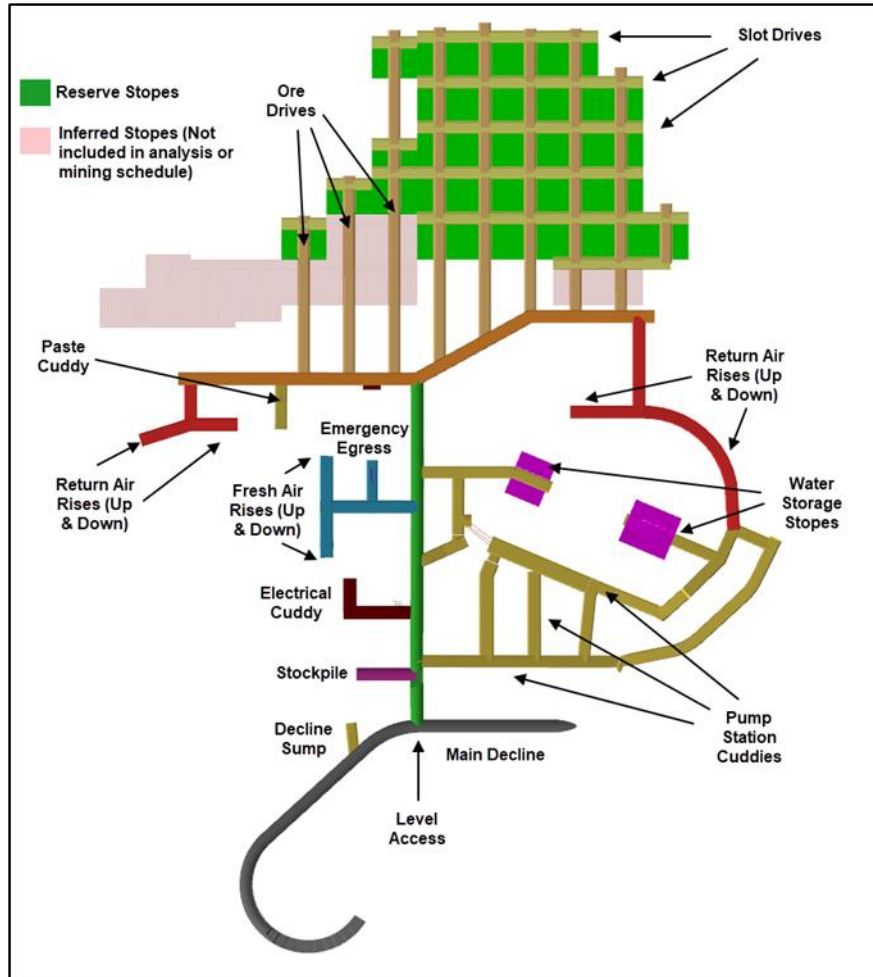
Didipio Underground Mine Design - Plan View of 2160 Level
